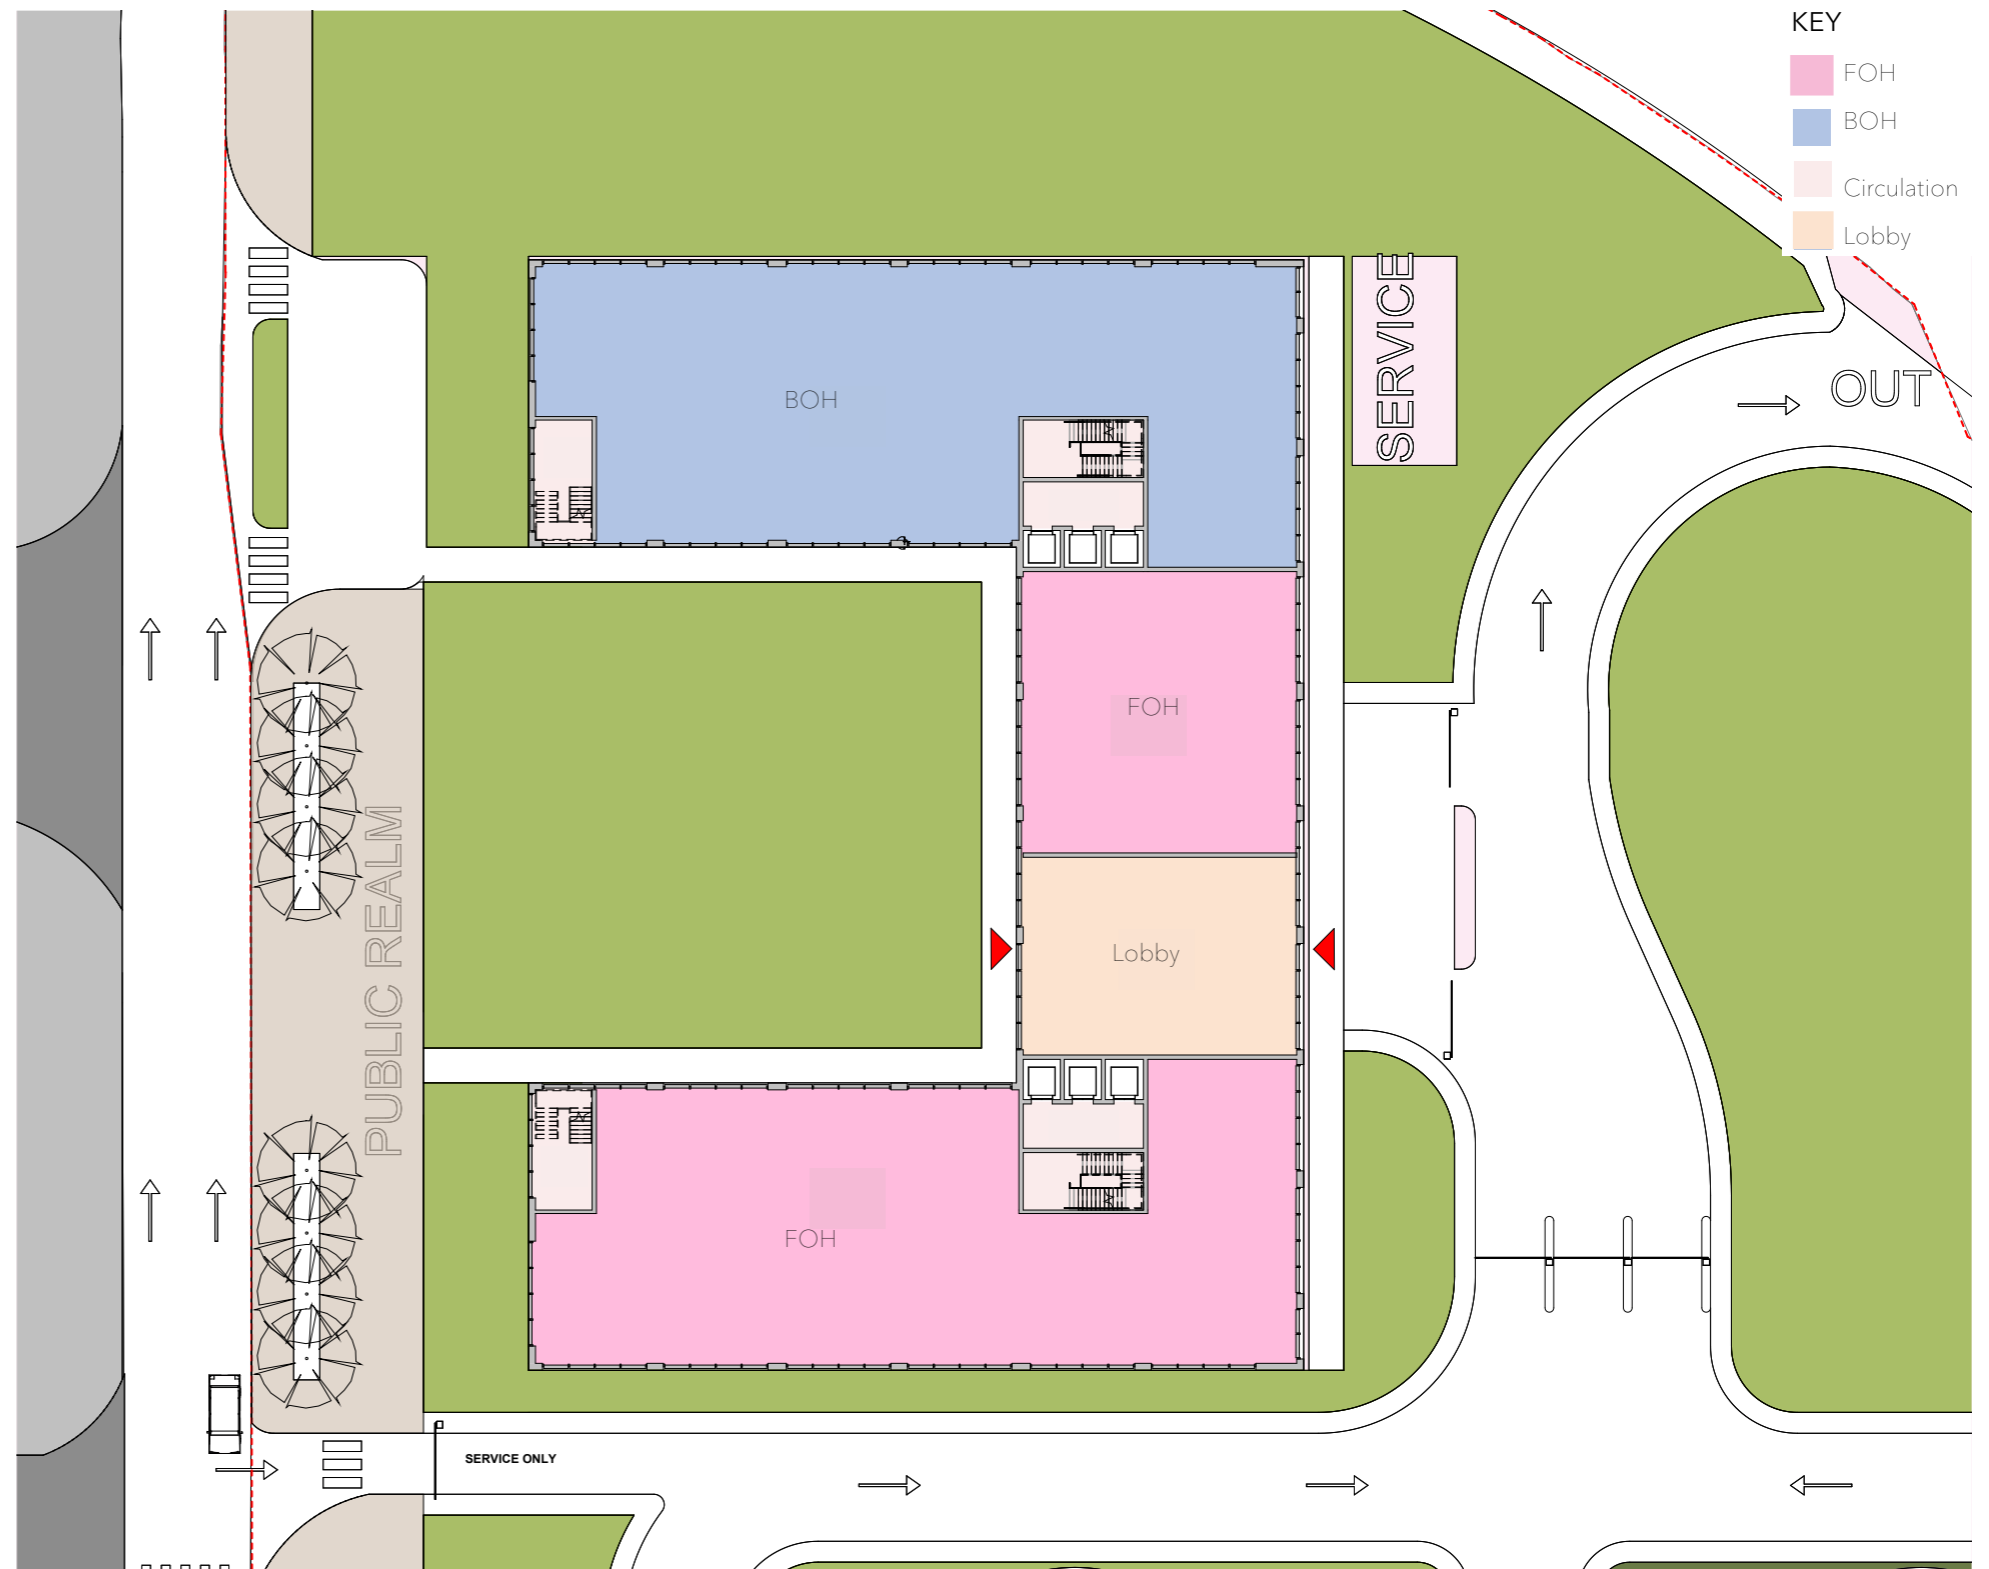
Proposed Site Plan - South Terminal Hotel - Car Park H
